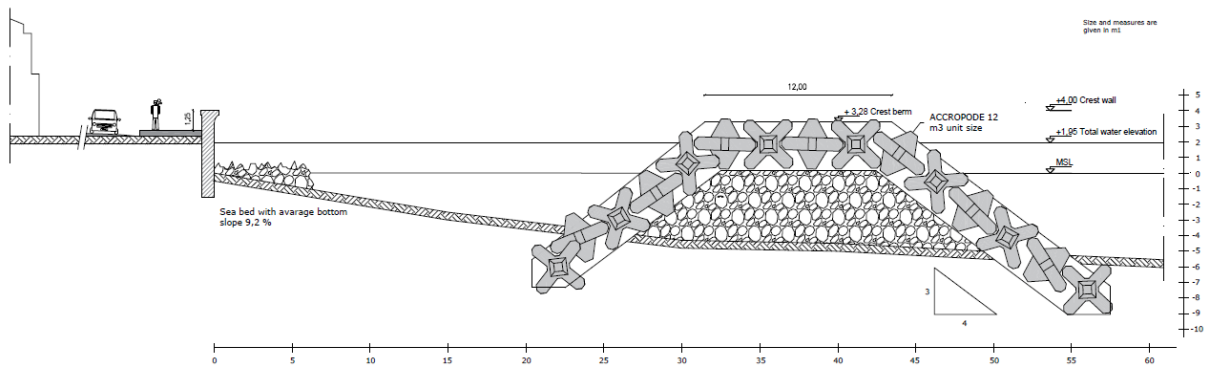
Detailed design for section 4.4, 4.5, 5.3 and 5.4
